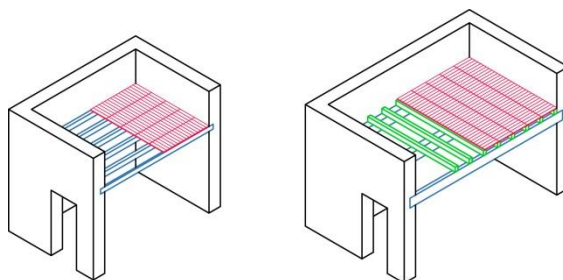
Typical layout of traditional timber diaphragms in vernacular buildings: (a) wooden beams covered with cross board sheathing; and (b) two-way traditional timber floor with secondary set of timber joists (Ortega et al. 2018)
